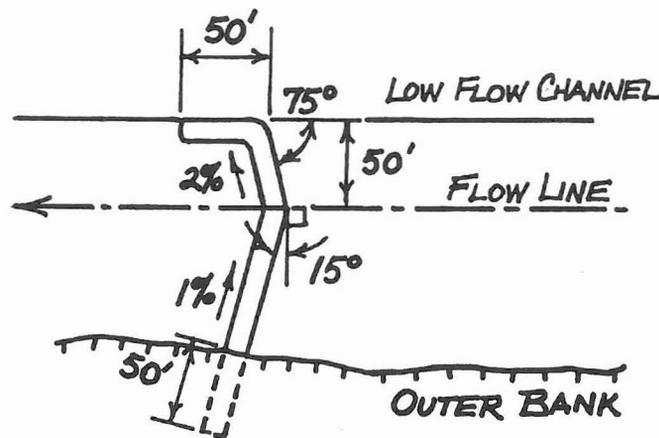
Typical plan view of originally proposed guide dike installation.
